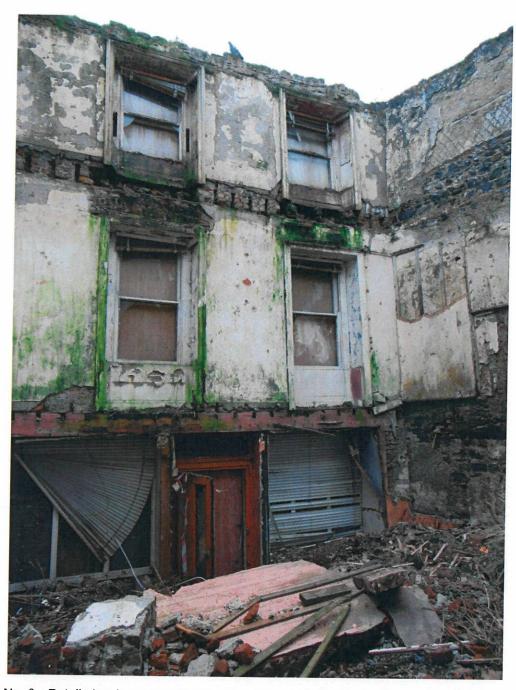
Detail view looking west inside the Shamrock Square buildings. The shopfront to the northern building is shown here, including its badly rotted timber lintel. That large timber beam has rotted due to being exposed to the weather over the last decade, and will shortly be unable to support the two floors of masonry above it.
